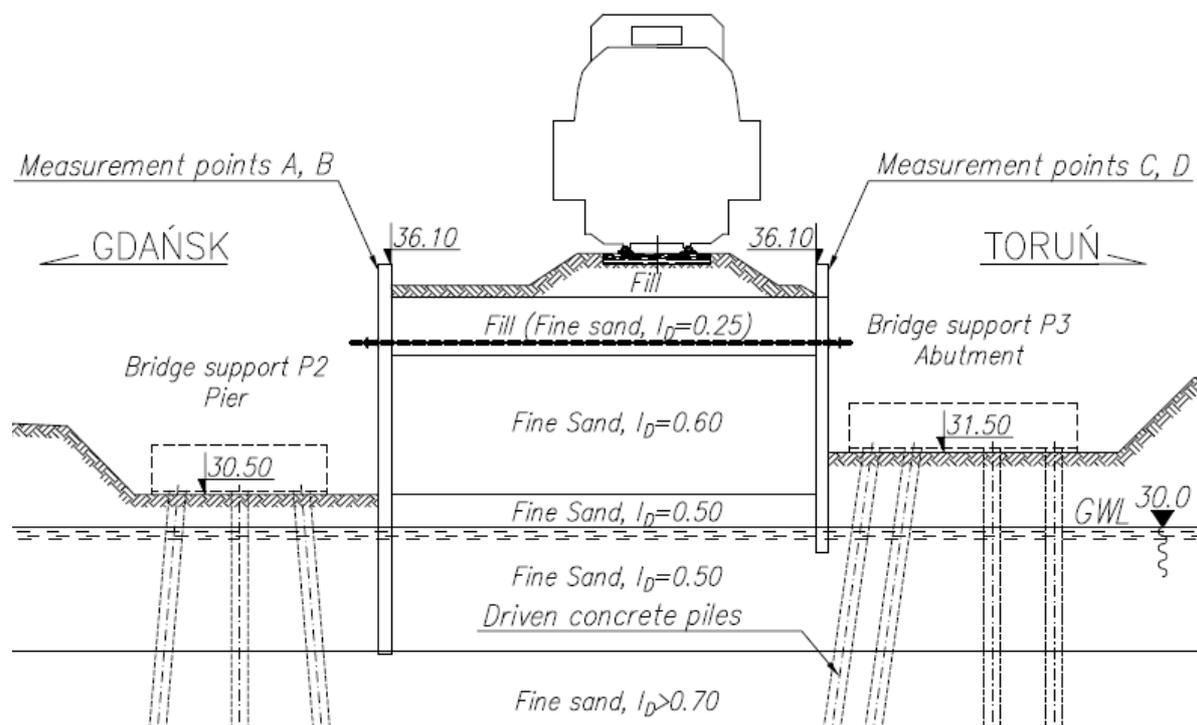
Embankment retained by sheet-pile walls (cross section after piling completion)
